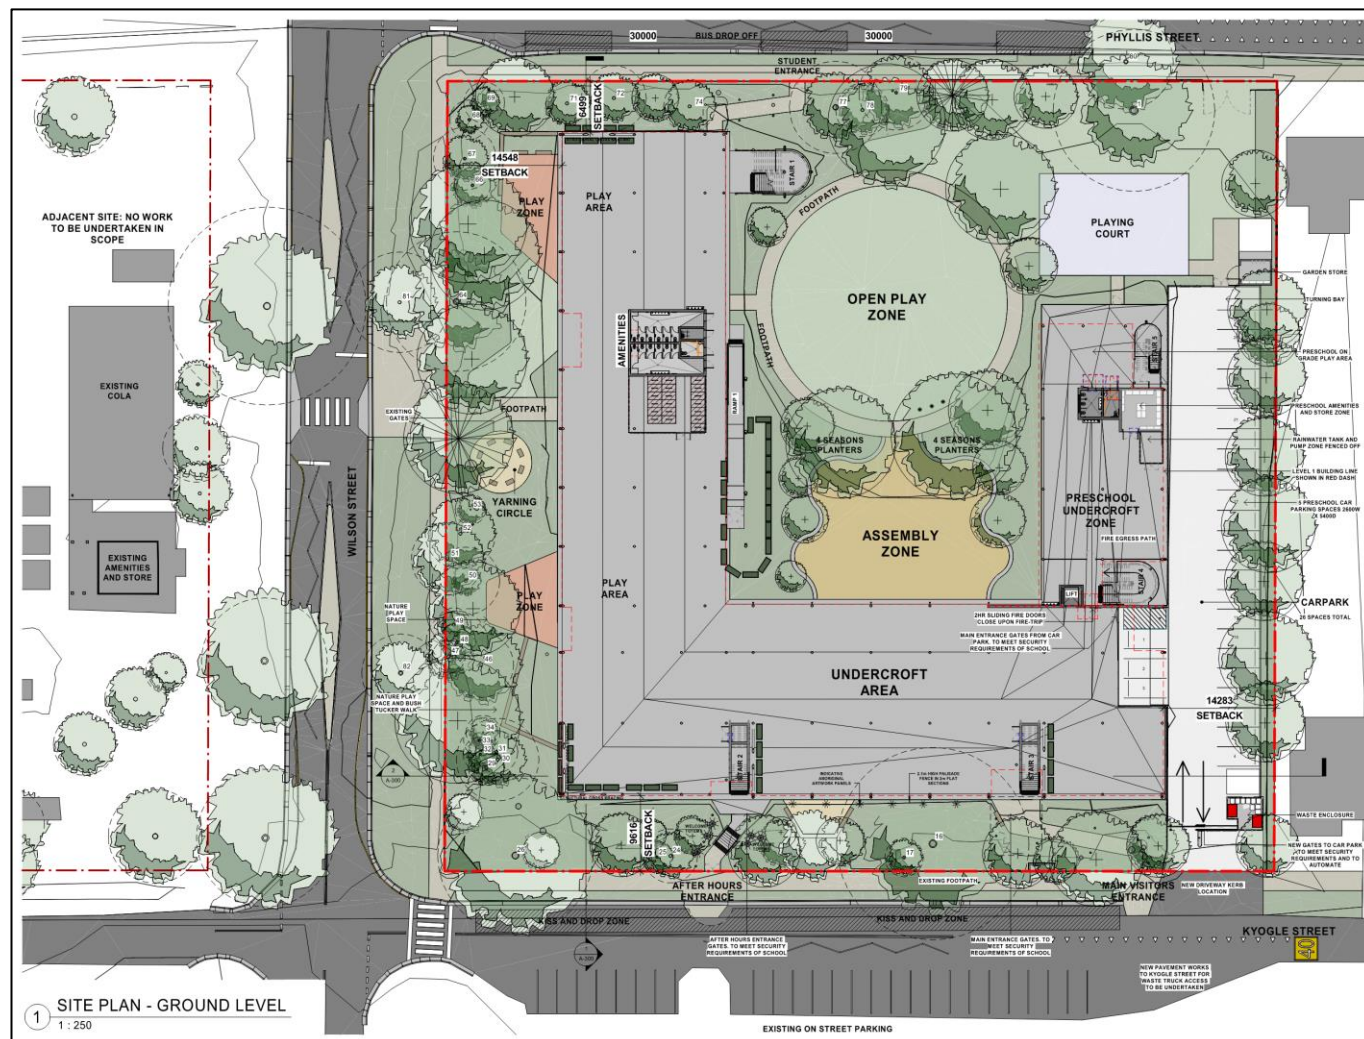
Proposed site plan (Source: EJE Architecture)
